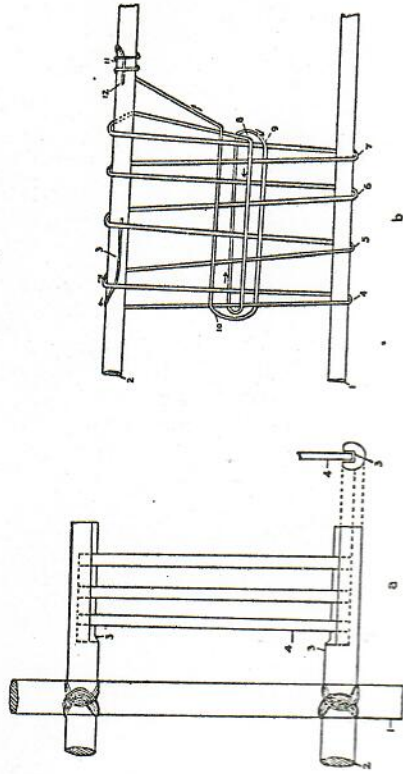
Details of house construction. *a*, making of house wall (*waiwai*): 1, wall post; 2, horizontal wall logs; 3, point at which slotting of inner surfaces of wall logs commences; 4, thin rails fitting at each end into slotted wall logs. *b*, suspended loop lashing (*vinu vakamau*), bracing first and second ridgepoles (*tau matau, tau lue*), also bracing third and fourth ridgepoles (*tautalu* and *nii momoti*) in model *vaale atua* house: 1, main ridgepole; 2, second ridgepole; 3, buried commencement end of semit braid laid on ridgepole; 4, four figure-of-eight turns (4, 5, 6, 7) made around both ridgepoles; free end (8) passes in one circumferential turn round four figure-of-eight turns; free end then passes (9) through lower loop of figure-of-eight and back through upper loop (10); lashing finishes with overhand knot made on one cord of outer loop or else free end passes up to second ridgepole where it makes two or more turns (11) and finishes buried underneath two turns (12) and pulled tight.
